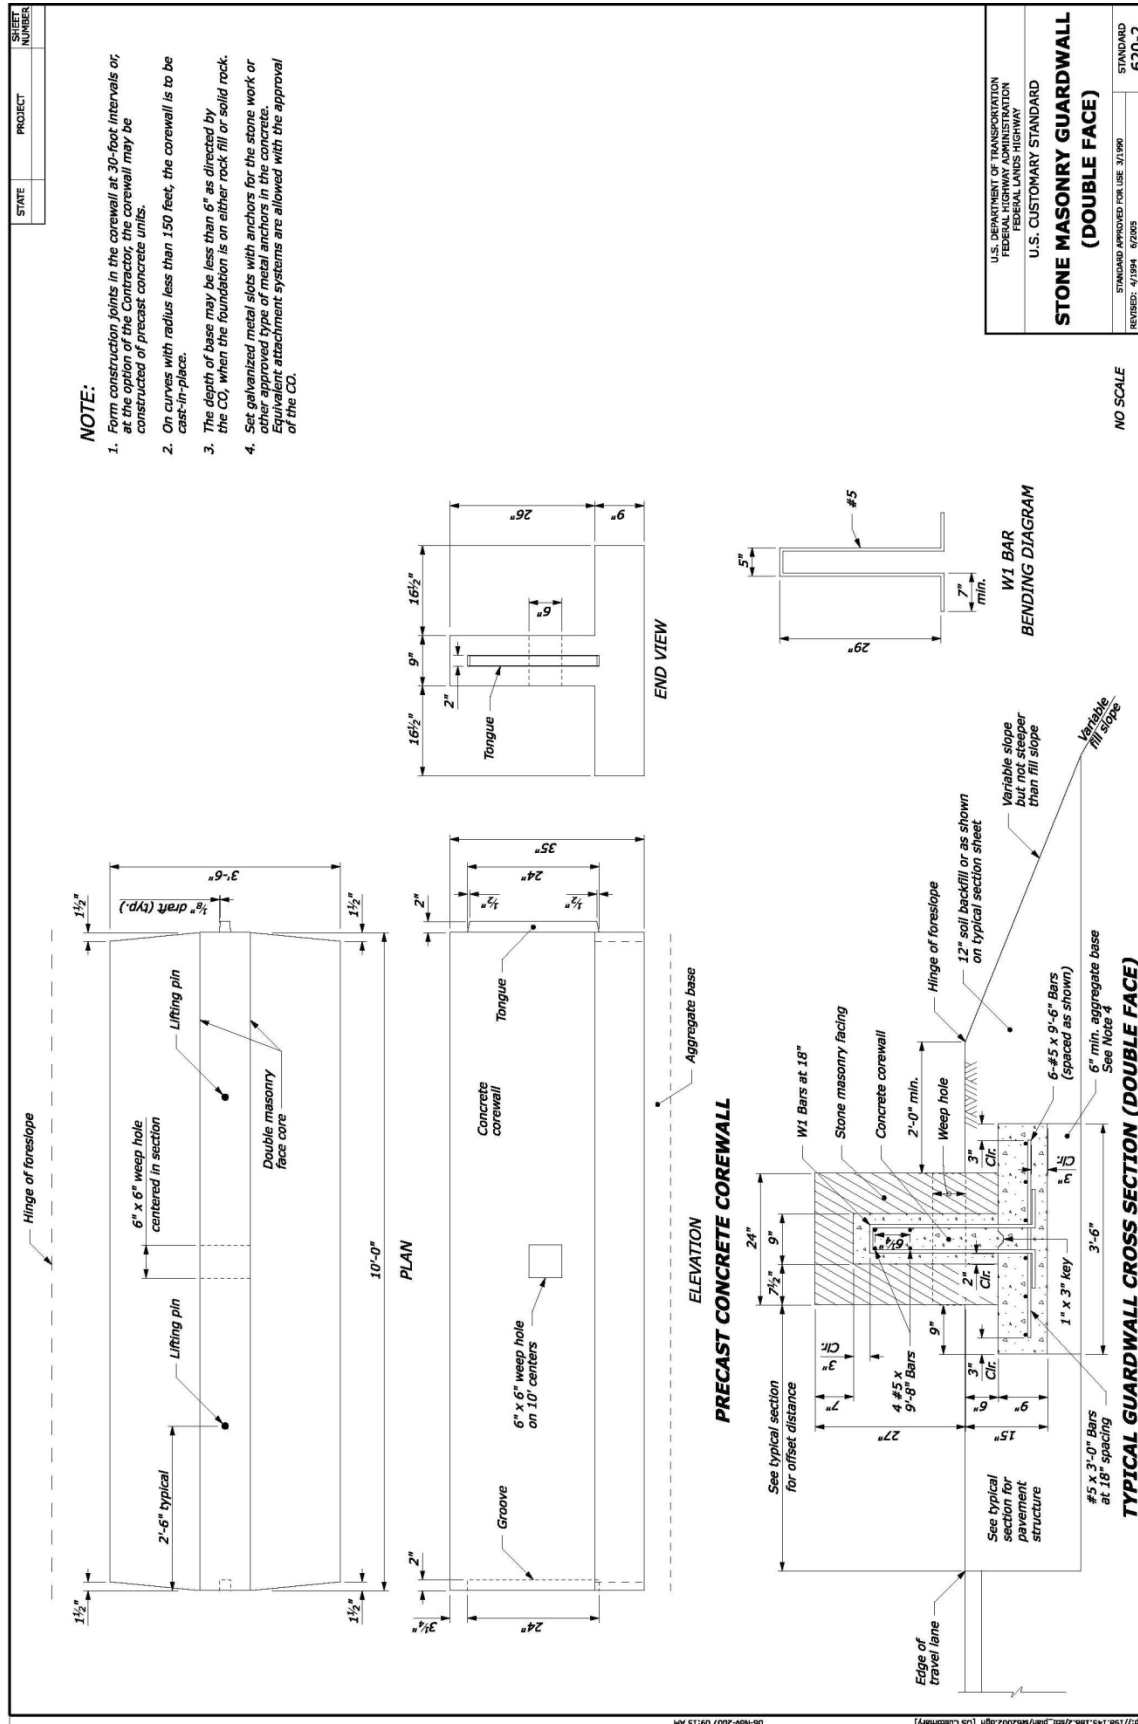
Stone Masonry Guardwall (Double Face) – Standard 620-2
